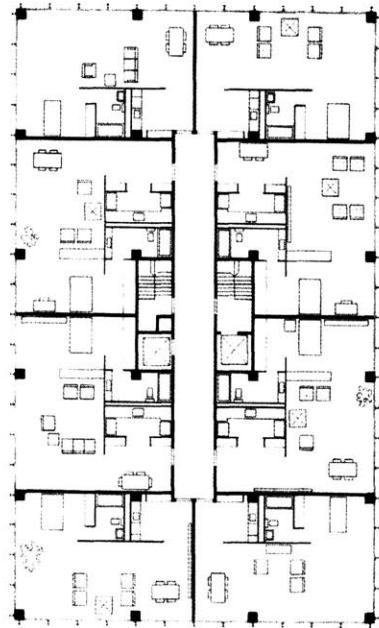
Typical plan for 860 Lake Shore Drive - unbuilt.
